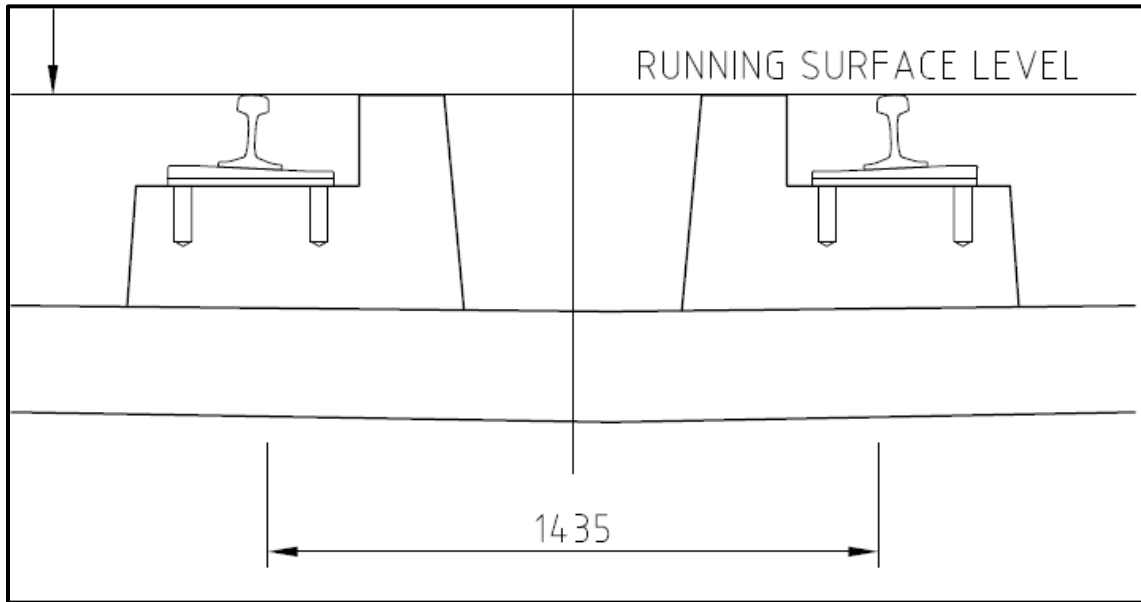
Plinth Cross-Section with Anti-Derailment Curb
